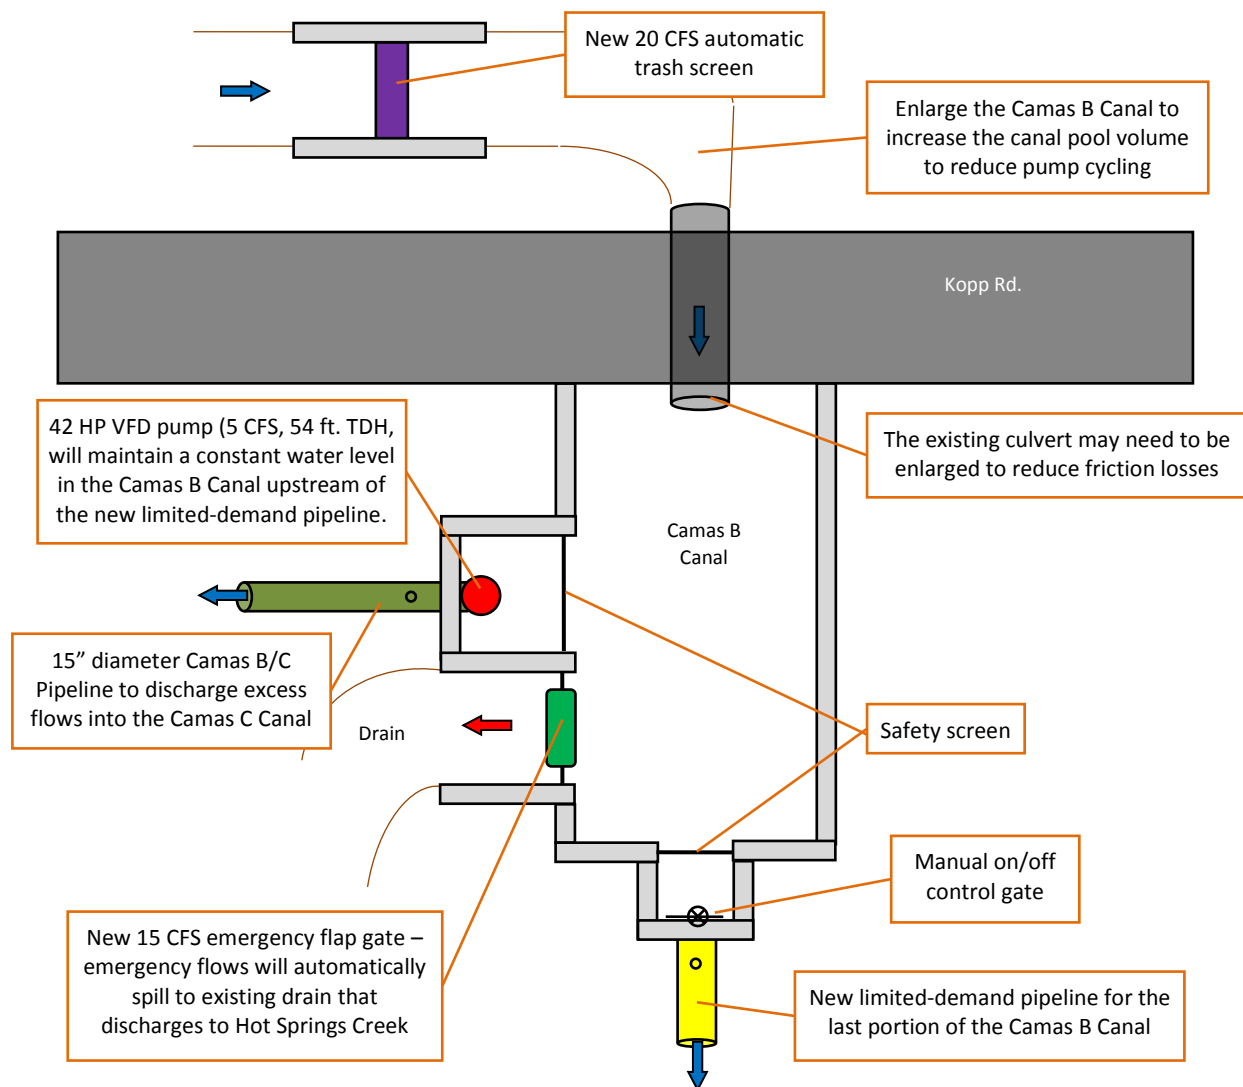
Conceptual plan view of new control components in the Camas B Canal at Kopp Road (not to scale)
